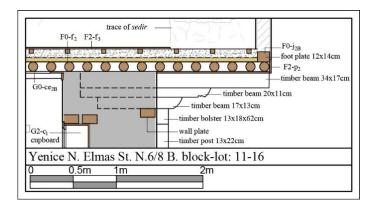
Section drawing of projection supported with overlapped beams and timber post; projection with overlapped beams, Type2 (Yenice N. b. block-lot: 11-16)
